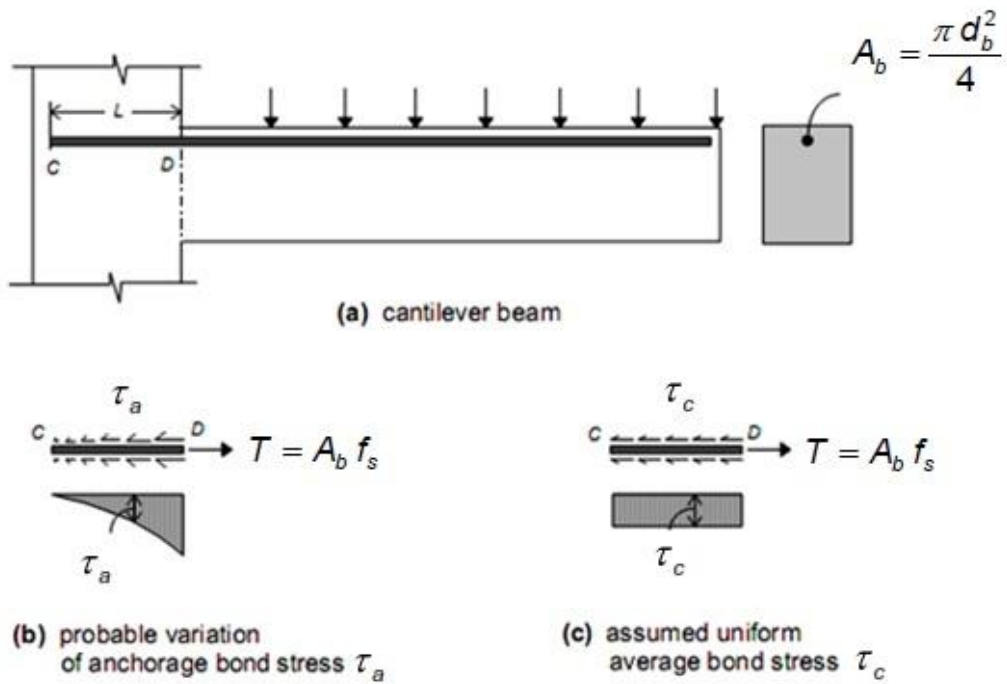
Anchorage bond stress (Pillai and Menon, 2010)
